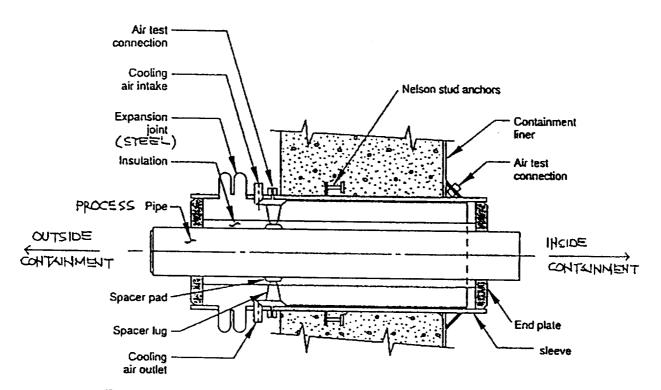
Typical Piping Penetration with Bellows - Concrete Containment.
